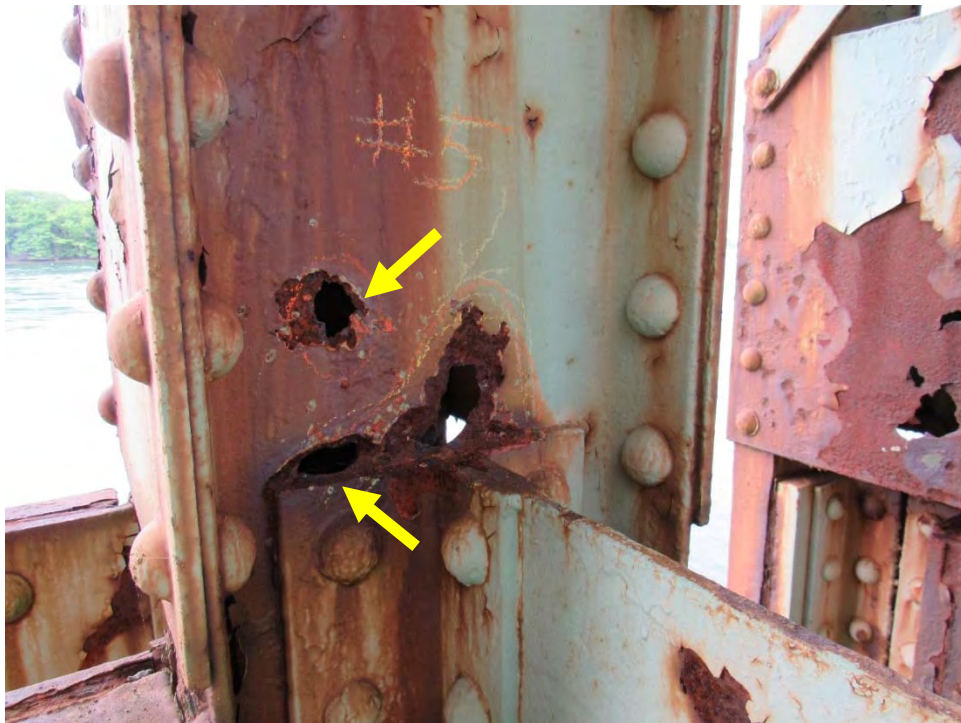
2016 Inspection – Span 8 West Member L14U14 (New Holes and Section Loss)
